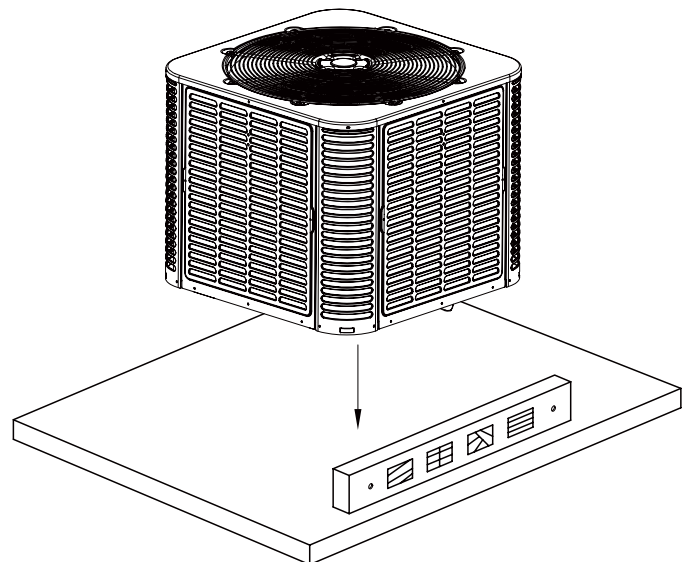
Outdoor Unit Placement on Cement Slab
